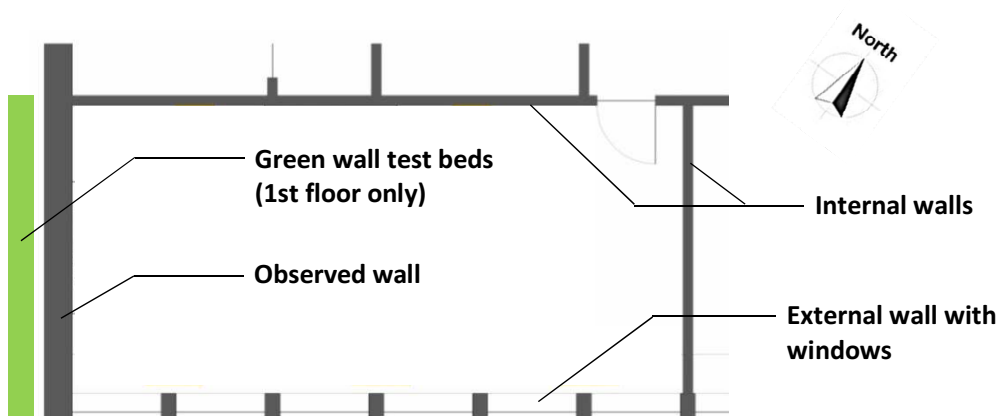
Floor plan of the observed classrooms. Green wall test beds were installed to cover the southwest facing wall of the first floor classroom
